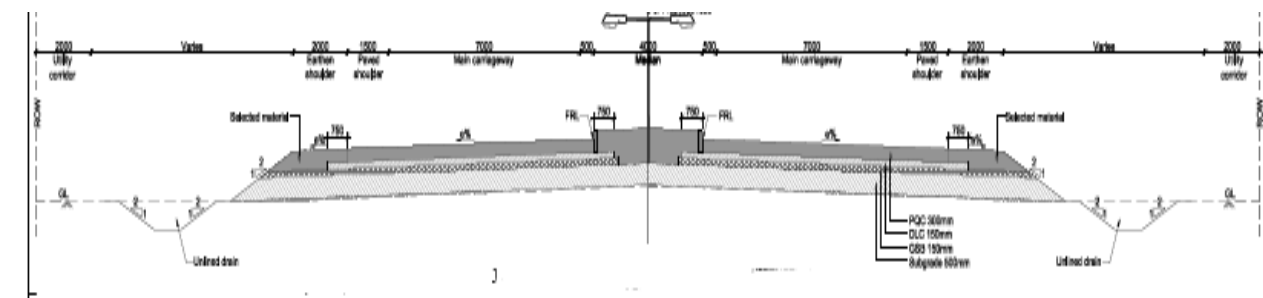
TCS-6 4-lane road for new construction with rigid pavement both side
